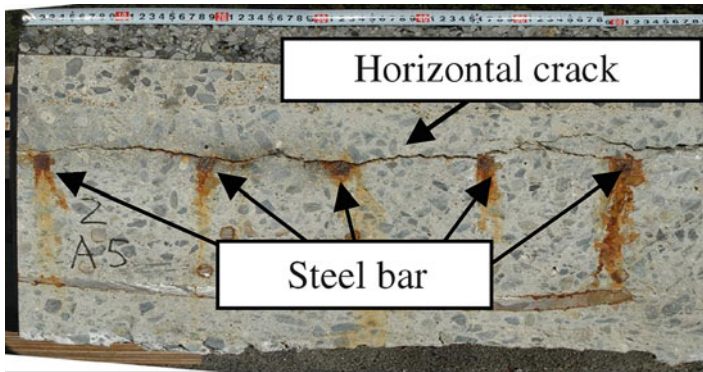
Occurrence of horizontal cracks in cut cross-sections of a RC slab
